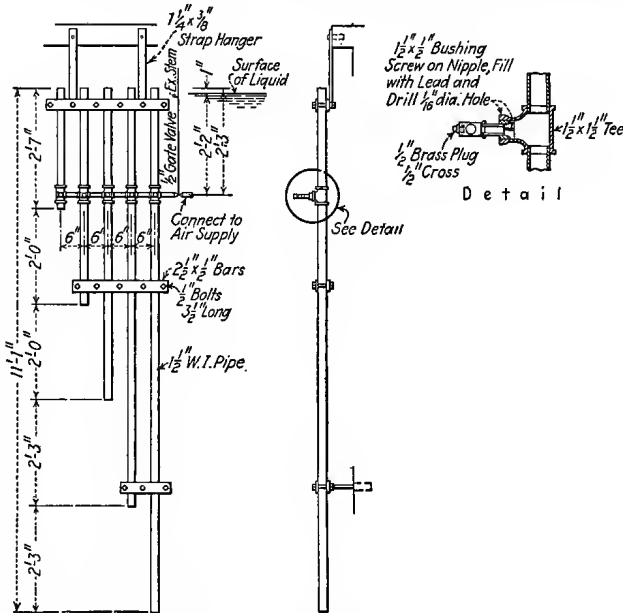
Sludge-level indicator used in final-sedimentation tanks, North Side plant, Chicago.
